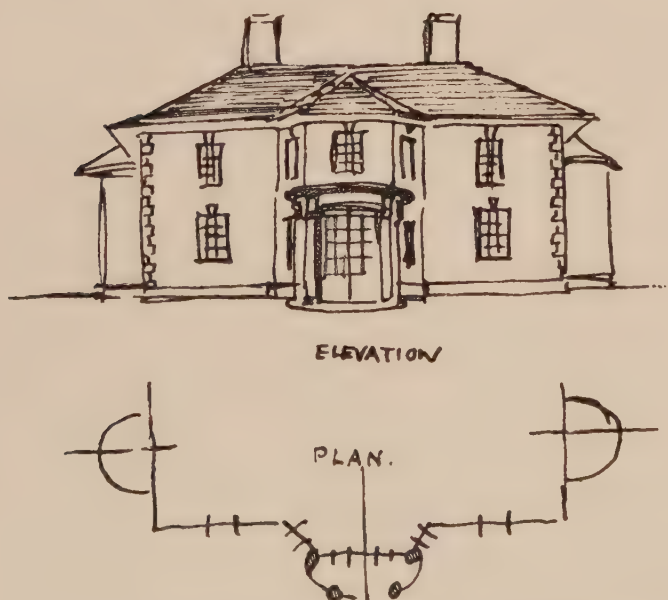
PLANEFIELD HOUSE, DORSET, NEAR POOLE, 1798. Stucco Wall, Slate Roof.
